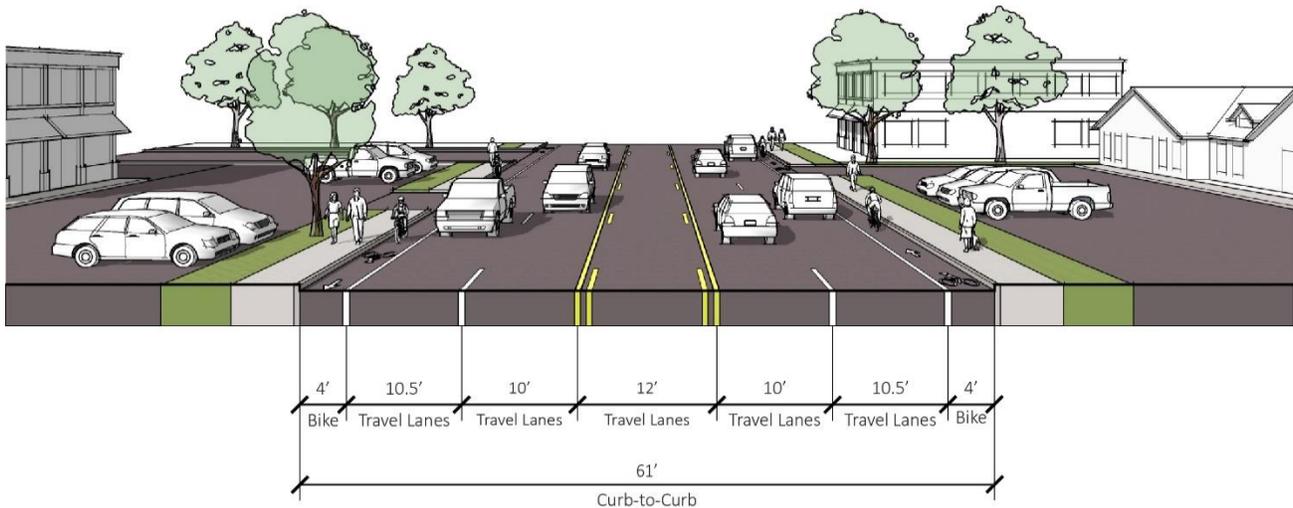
illustrates an alternative which provides on street bicycle lanes without moving the curb(s). This alternative requires the outside travel lanes to be reduced from 13-feet to approximately 10.5-feet and the inside travel lanes from 11.5 feet to approximately 10-feet while maintaining a 12-foot two-way center turn lane with four-foot bike lanes. Although this alternative accommodates bicyclists on-street, it is not preferred based on the level of traffic stress (described in detail in the following section). The city's Transportation System Plan (TSP) states, "standard bike lane widths are six feet; although five feet may be approved on a case by case basis." Providing bike lanes less than five-feet is not suitable for the majority of users and therefore, may not be utilized to their full extent possible.
